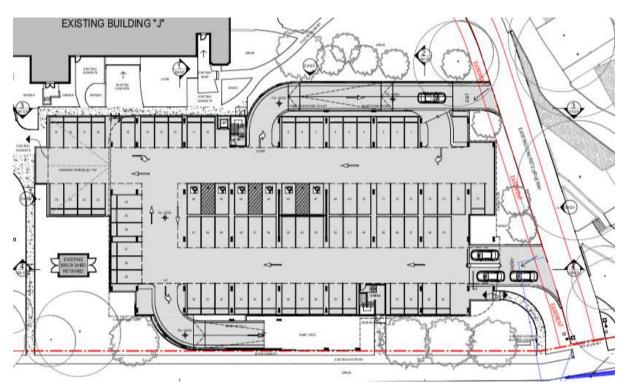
Proposed car park ground floor plan (Source: Gray Puksand)
